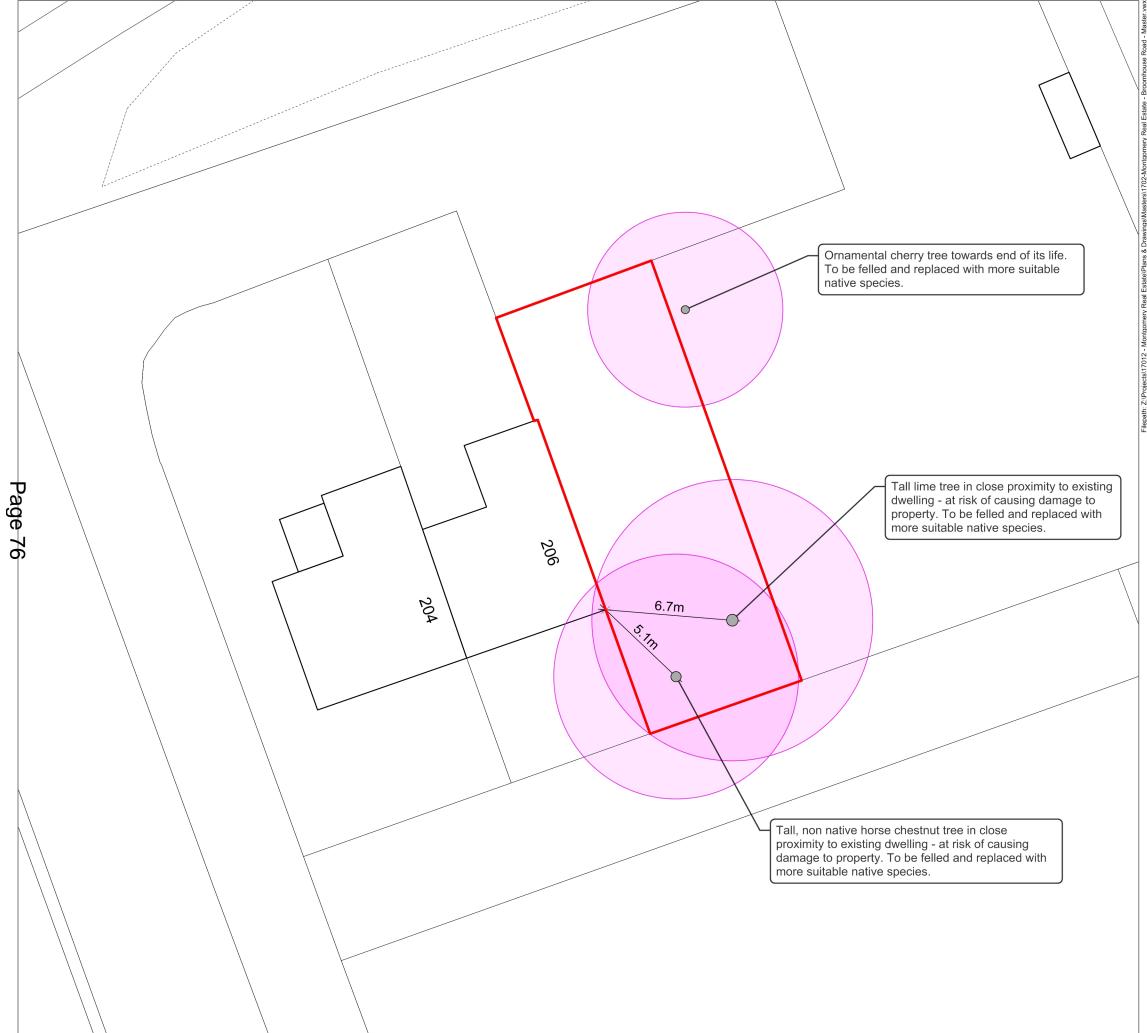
Broomhouse-STEX-P102 Site Boundary
